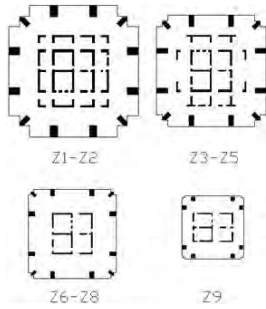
Typical layout plan for Scheme 1 (Source: Guangjing Sha)
